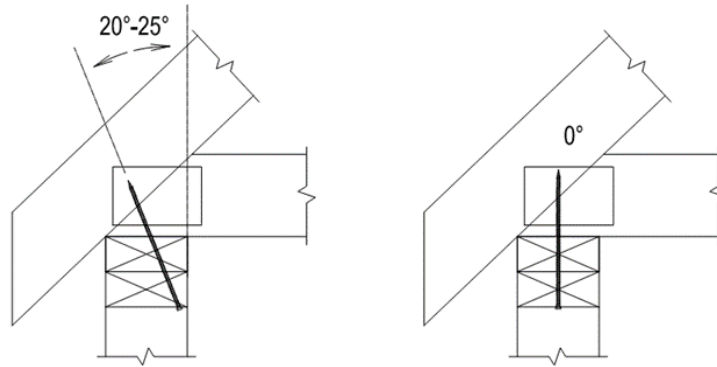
Installation of Fasteners in Truss/Rafter/Joist to Double Top Plate Connections
